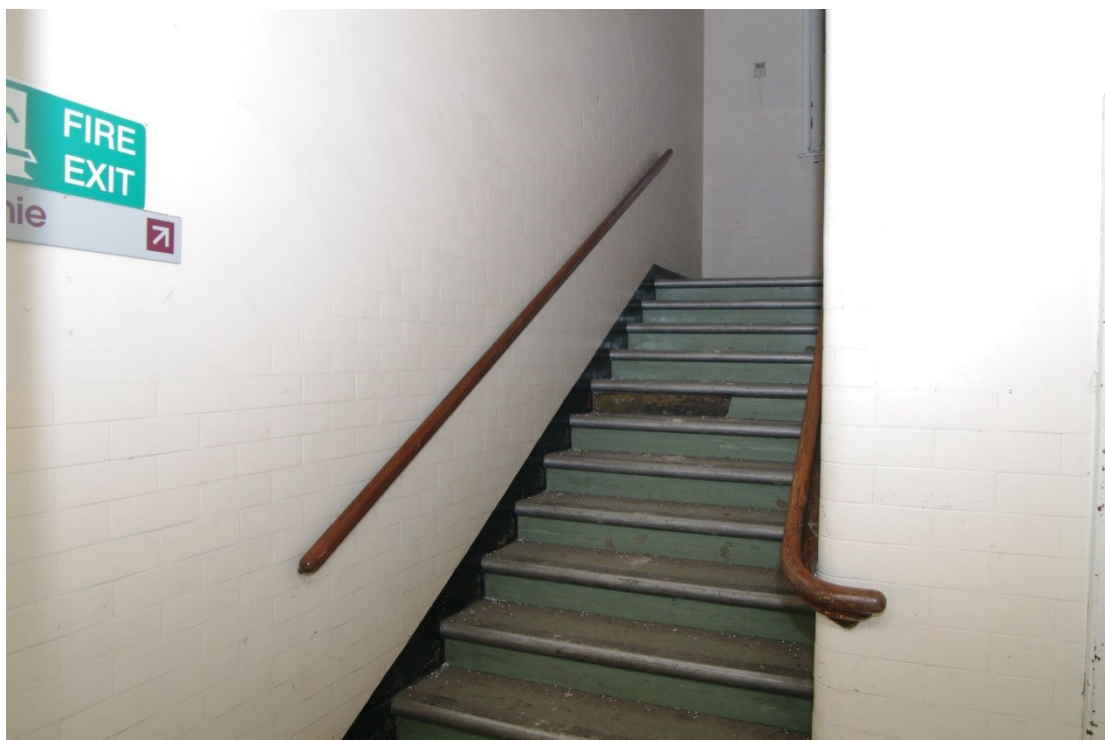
Zone 3 ground floor photo 36 stairs and hand rails
